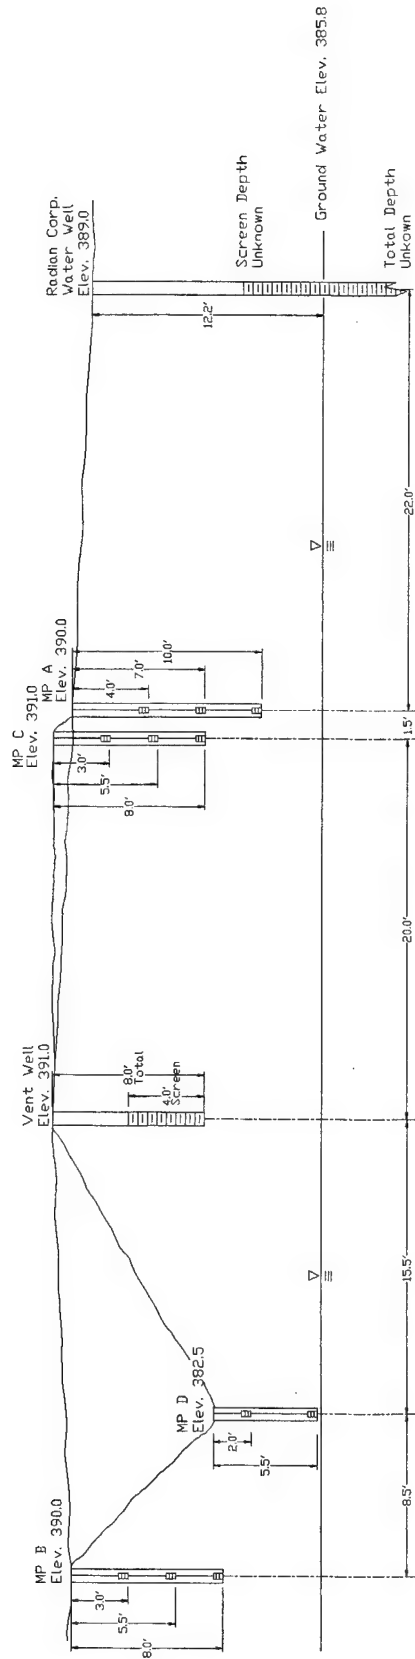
Cross Section of Vent Well and Monitoring Points at the Power Plant Site Showing Elevation Differences
